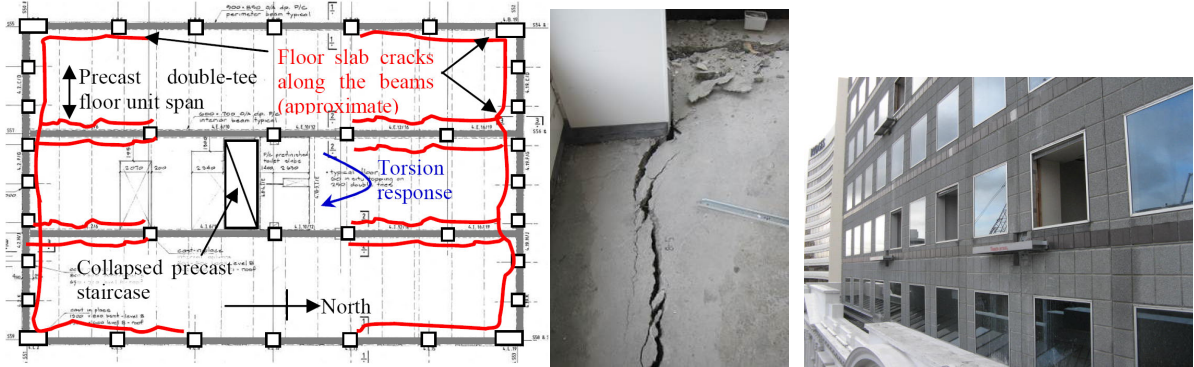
Separation of precast floor slabs from supporting perimeter moment frame in 18-storey office building. Photo to right (courtesy of D. Bull) shows temporary supports for columns after earthquake.
